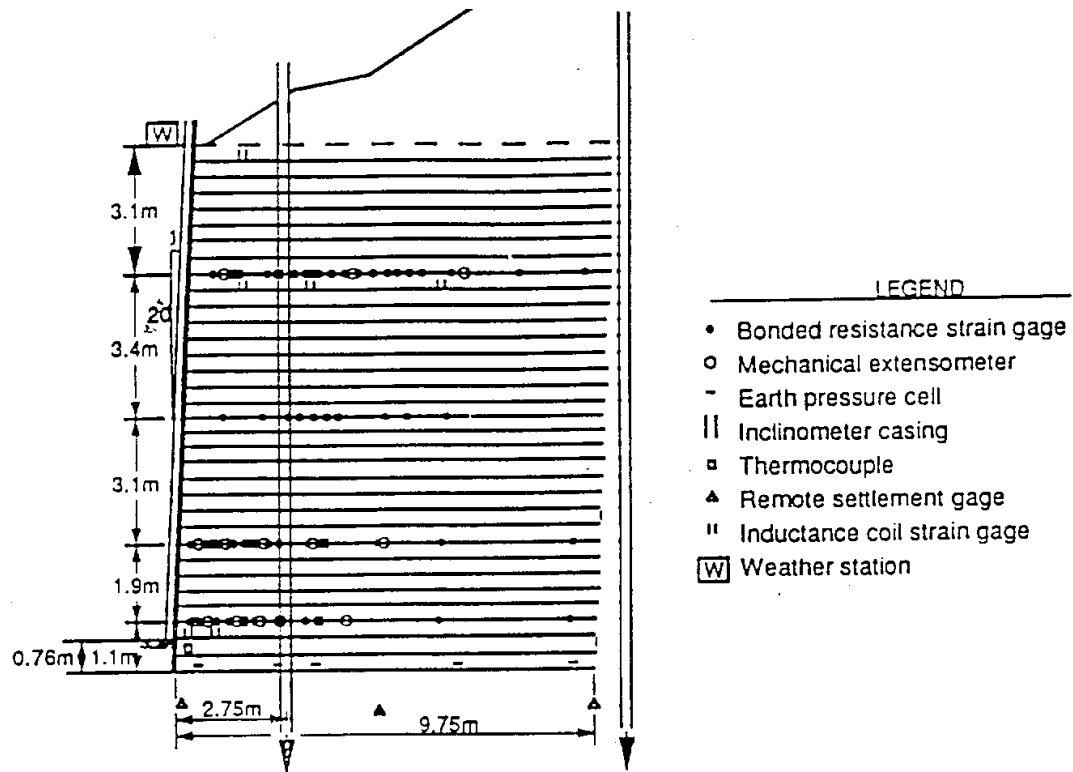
Instrumented wall section of Rainier Avenue wall (after Allen et al., 1992).
